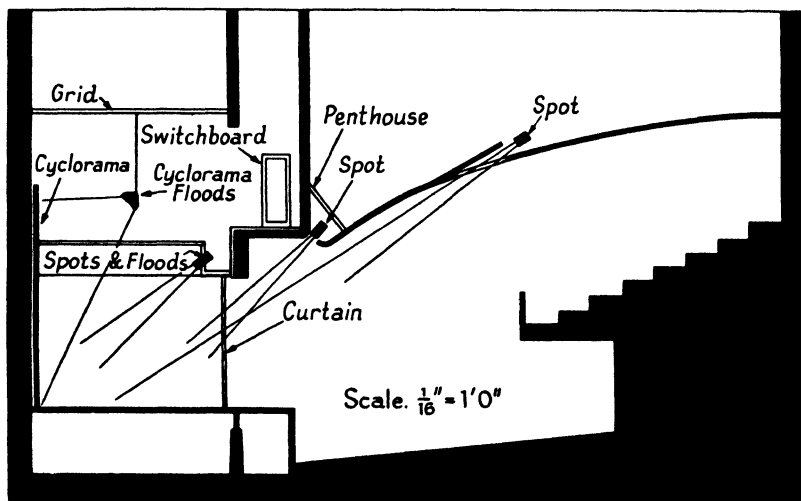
EXAMPLE "I": SECTIONAL VIEW OF LIGHTING AT BRADFORD CIVIC PLAYHOUSE
